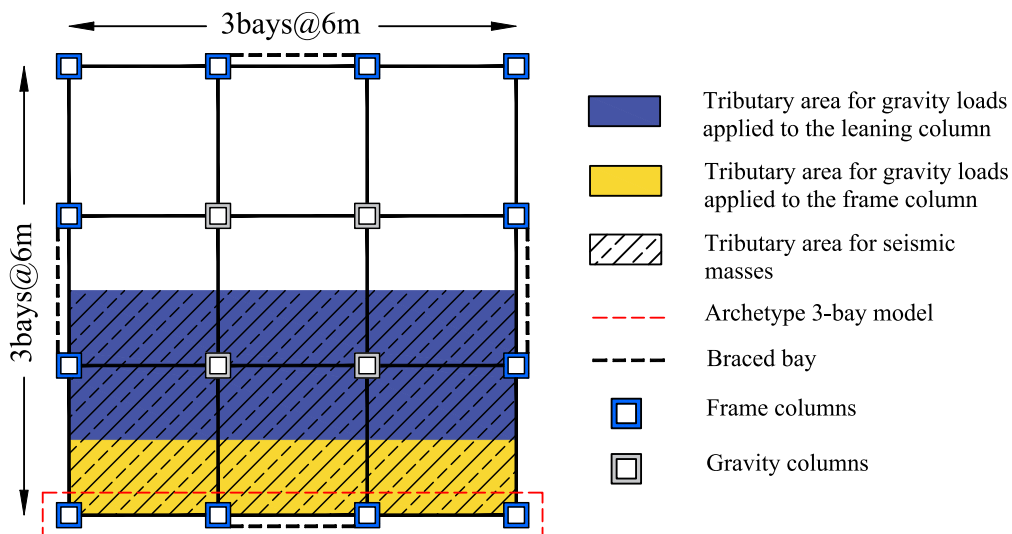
Plan view of QXB-MF and QIXB-MF archetypes.
